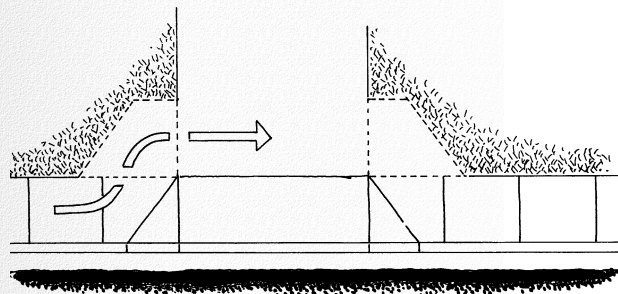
Additional right-of-way allows the sidewalk to be jogged back, providing level landings at driveway crossings and curb ramps.
